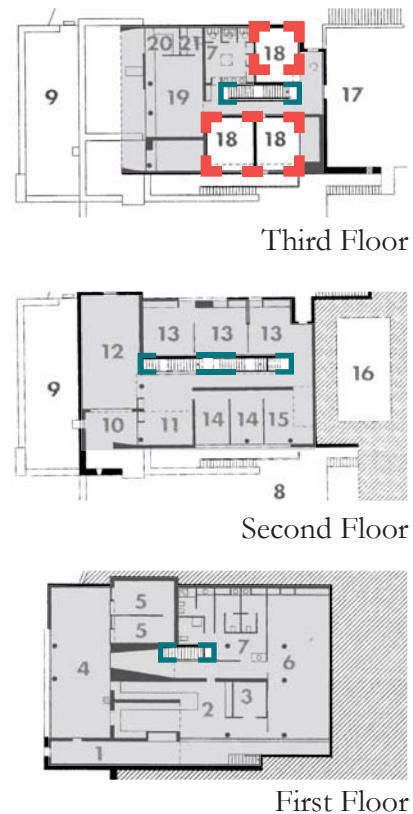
| Faro Rehabilitation Centre First to Third Floor Plans
